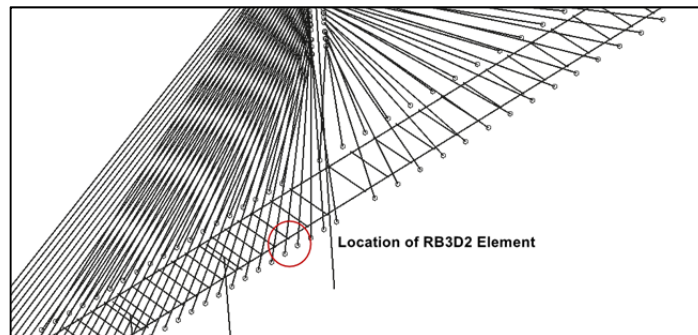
(a): Arrangement of RB3D2 between shear centre and mass centre of bridge deck.
